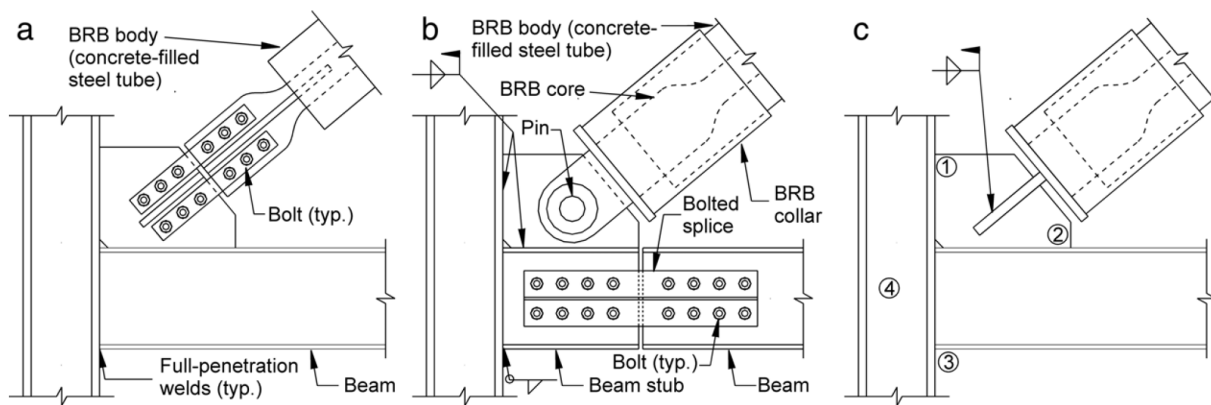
BRBF Connection Details (a) Continuous Beam, Bolted Brace; (b) Spliced Beam, Pinned Brace; (c) Continuous Beam, Welded Brace (From Wigle and Fahnestock, 2010: Used with Permission)
